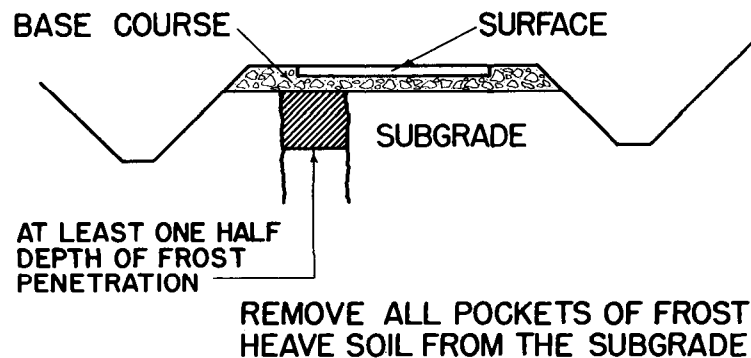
Pocket of Frost Heave Soil Excavated to at Least One Half Depth of Frost Penetration and Replaced with Non Frost Heave Soil.
